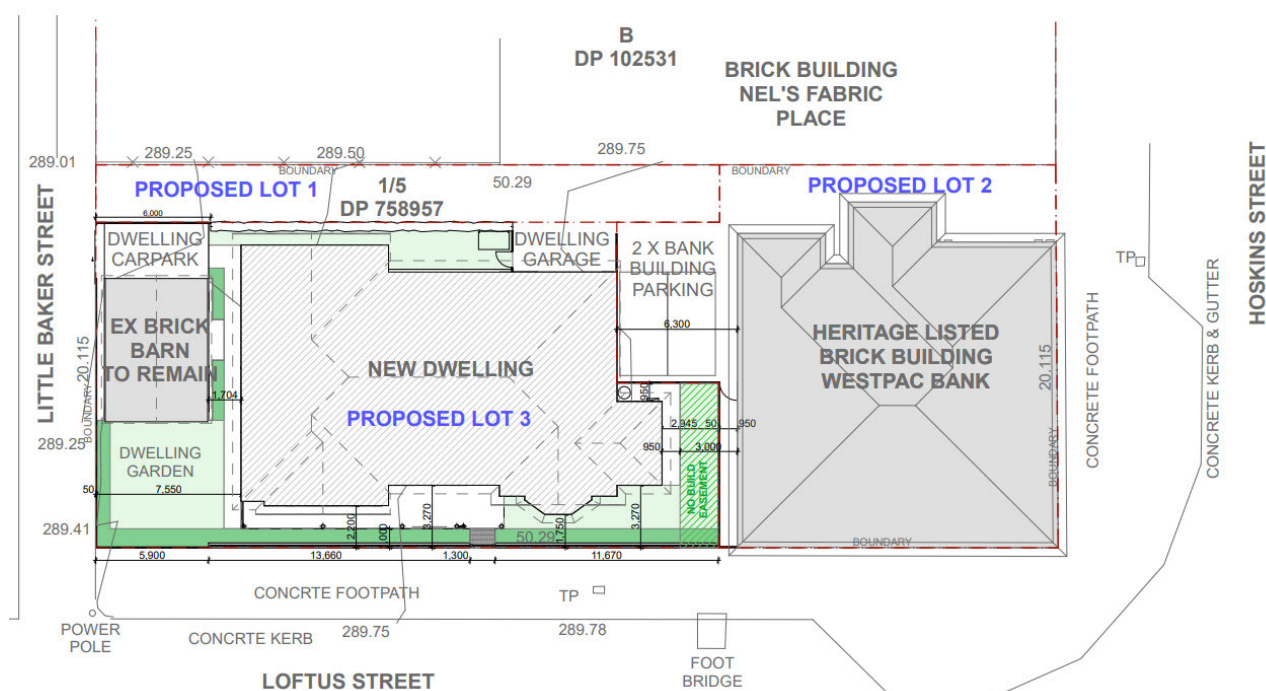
Site plan showing existing bank building, proposed new dwelling and existing barn building
